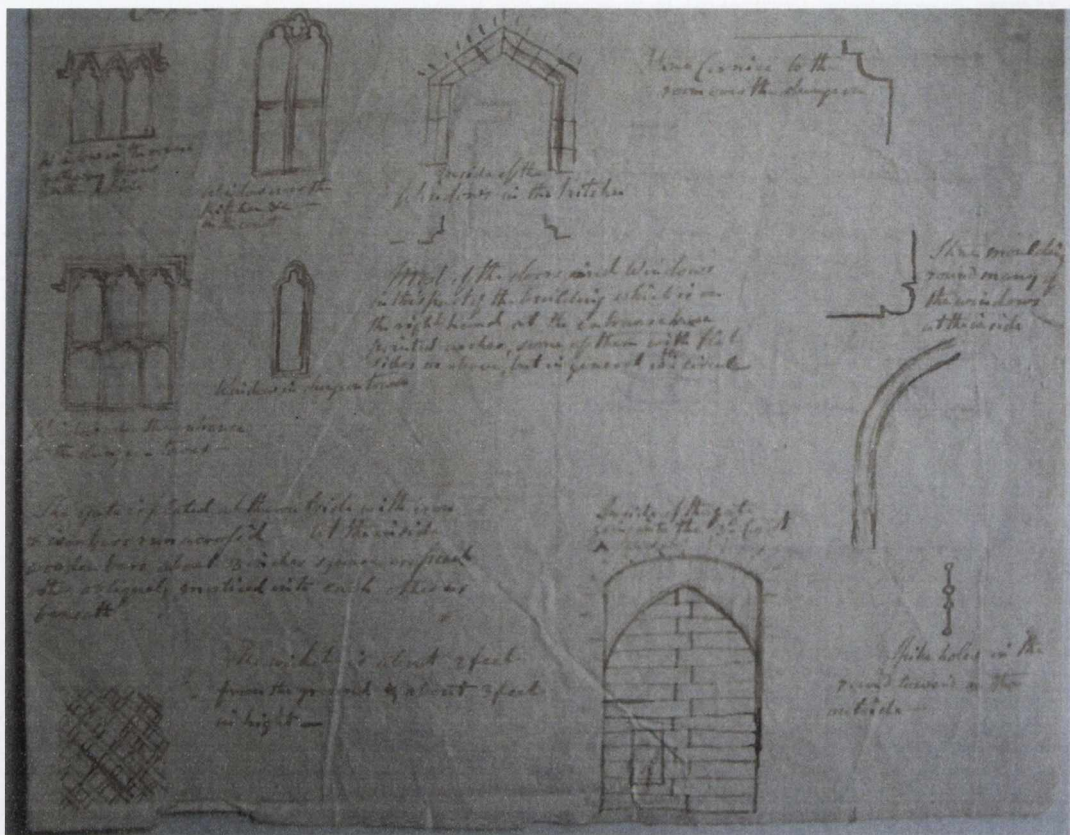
Chepstow Castle, sketch details, Laurence Parsons, n.d., Rosse papers, O/14/5.
